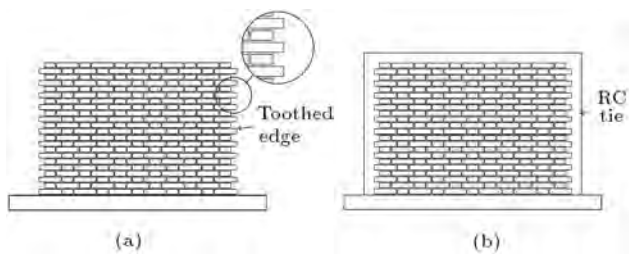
Construction sequence of CM walls: (a) Building masonry wall with toothed edges; and (b) casting reinforce concrete ties.
